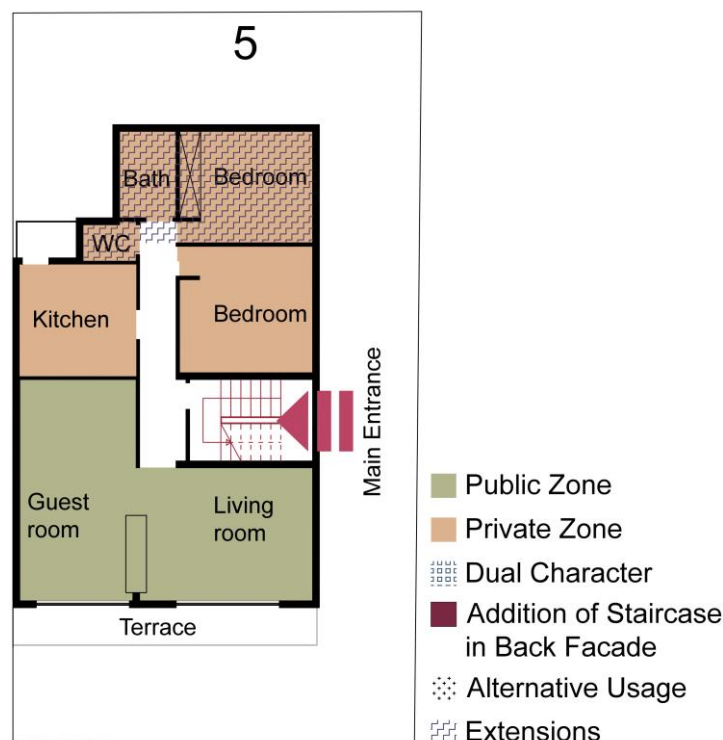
Upper floor sample of mutated type II with the addition of staircase in side façade (Author, 2017)
